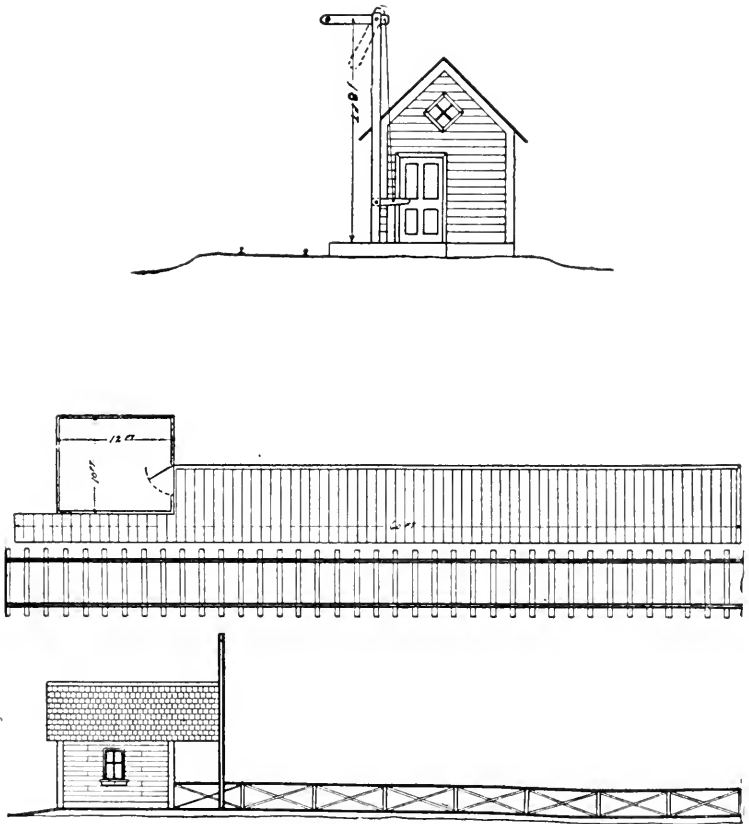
PLAN, SIDE AND END ELEVATIONS OF A STATION AND PLATFORM FOR FLAG STOP.
